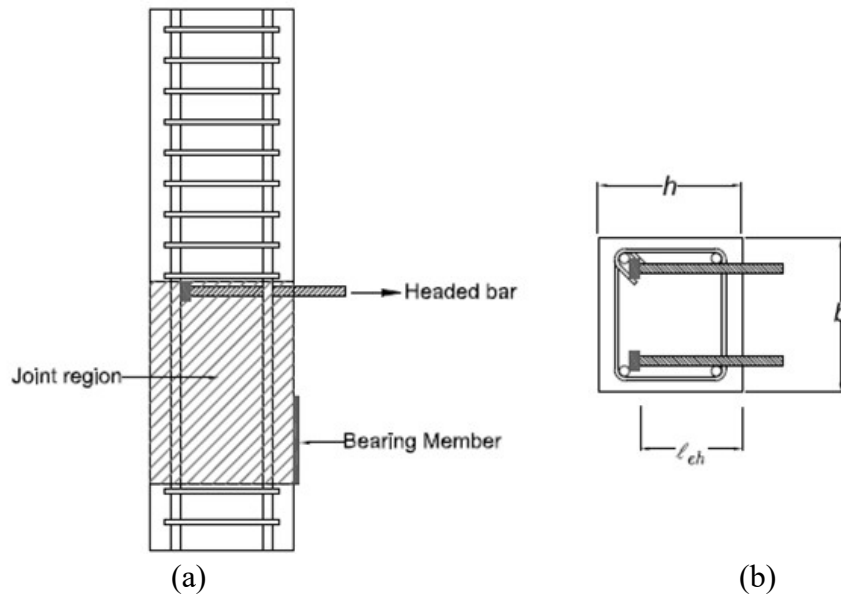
Typical beam-column joint specimen (a) side view (b) top view (Figure after Shao et al. 2016)
